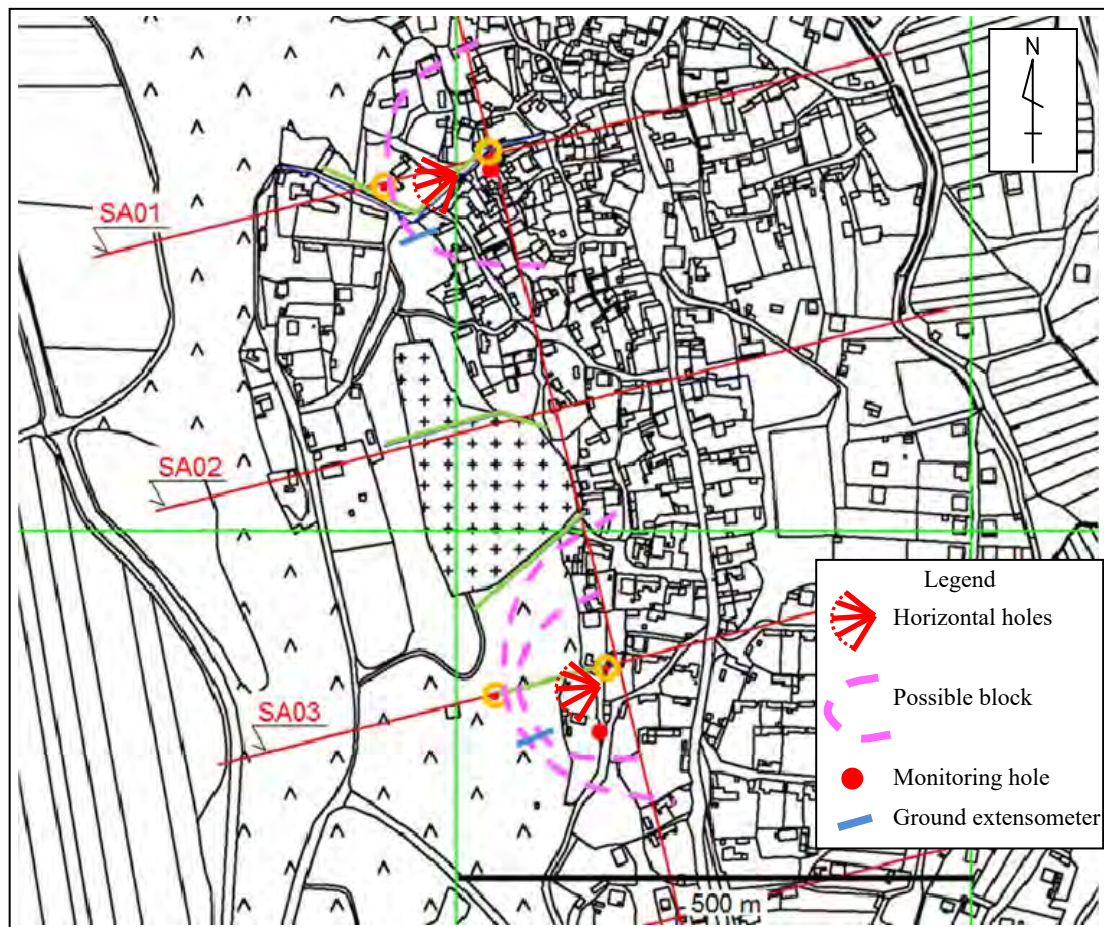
Possible locations of horizontal holes for Arapi site on a plan
